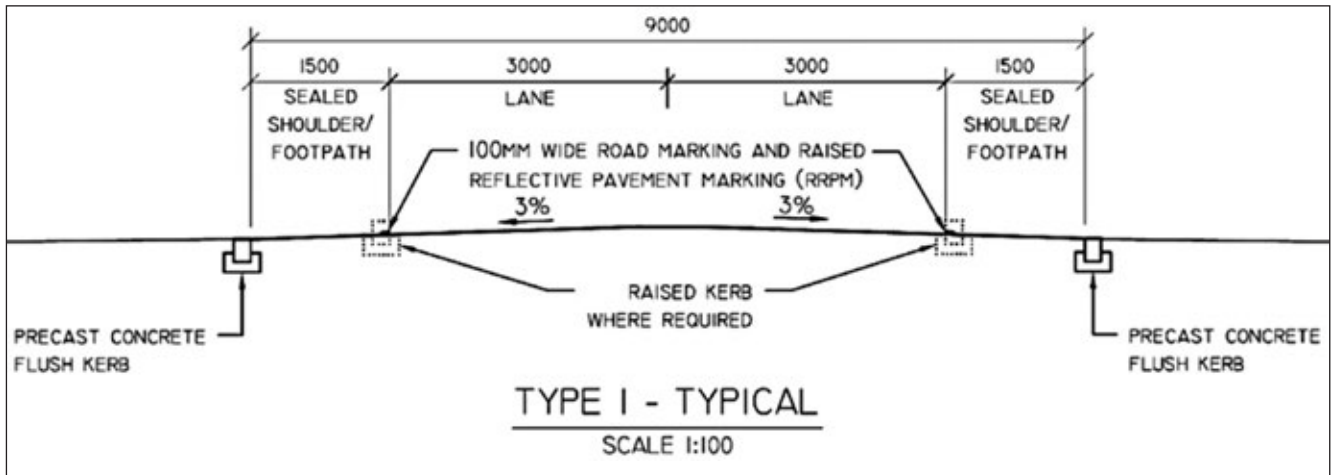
Typical road cross section for KRRP - Betio to Bikenibeu (Roughton International, 2011a)
